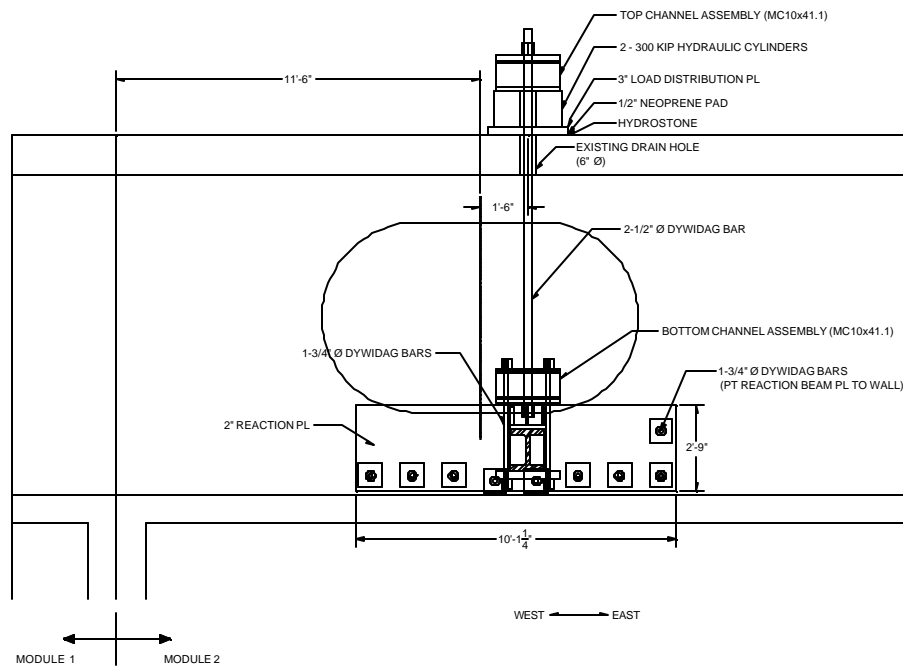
Setup for Deck Test - Elevation View from the South
